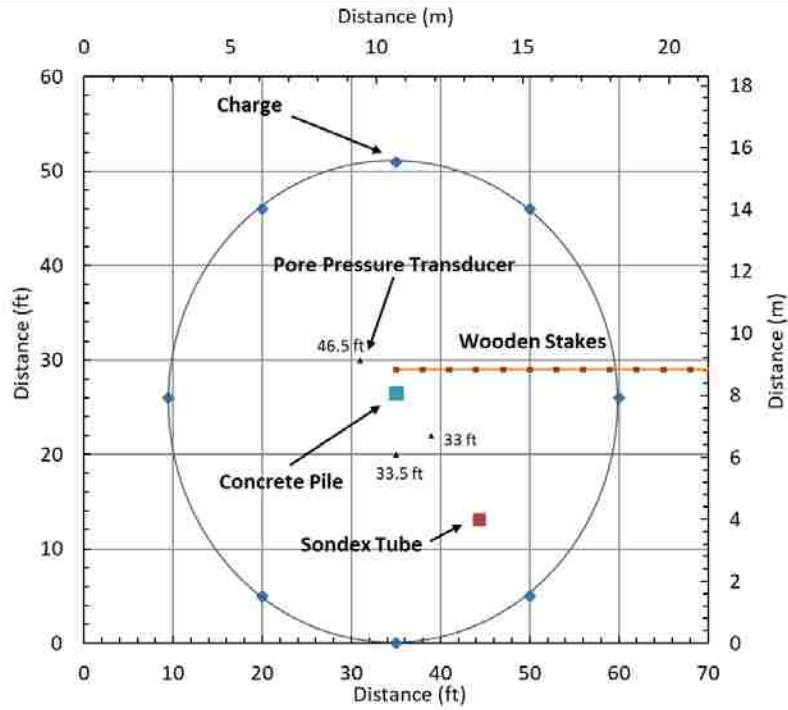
Detailed plan view drawing of the square concrete pile with blast holes and instrumentation.
